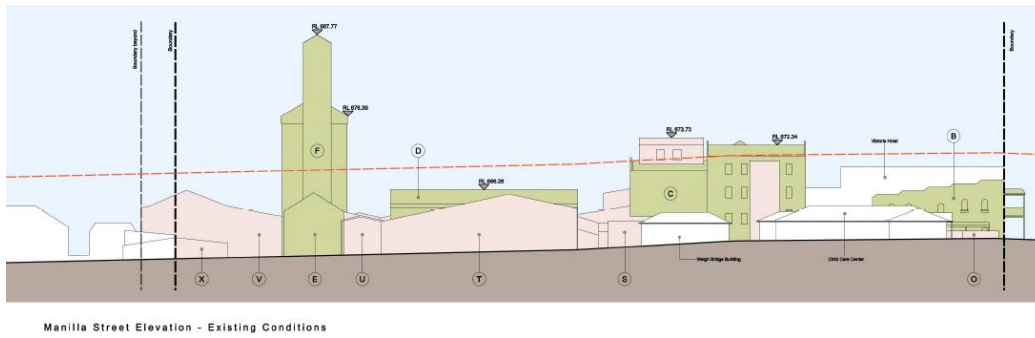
Manilla Street elevation (Source: Karl Walls Design)
